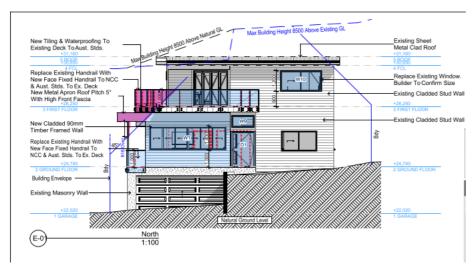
Northern elevation with ground floor within the side boundary envelope (amended plans)
